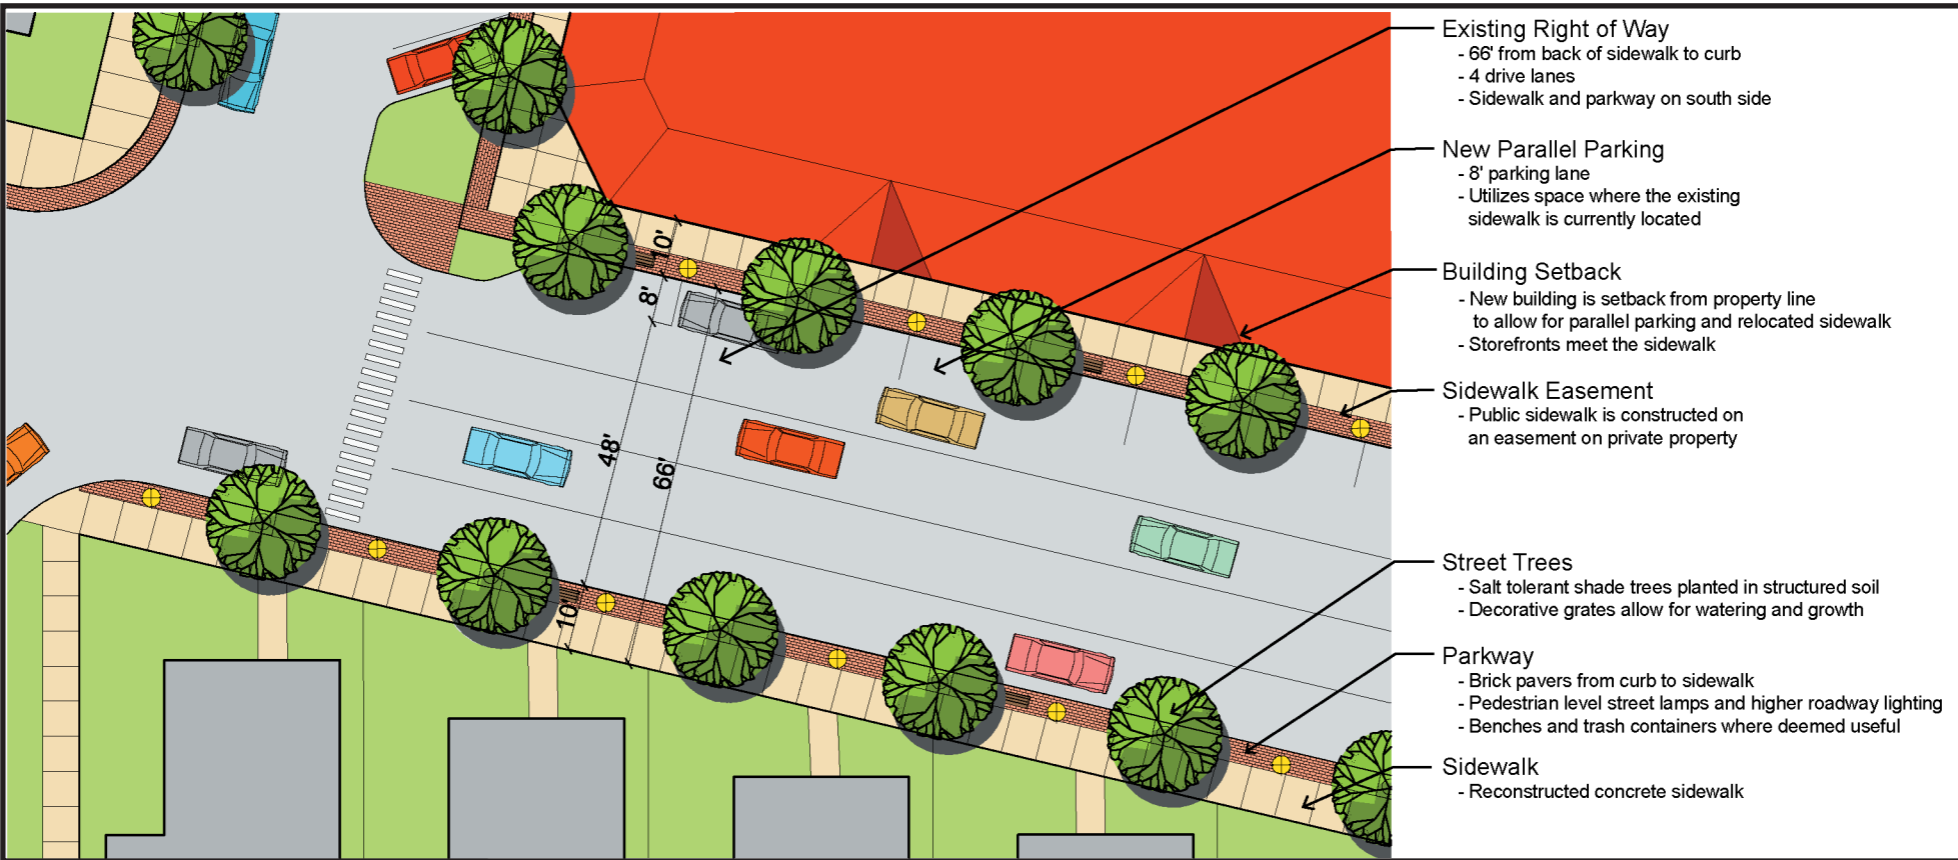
The addition of streetscape elements links together individual redevelopment projects up and down Grand Avenue. The band of red brick pavers in the parkway, the rhythm of street trees spaced evenly apart, and lamps placed at a level to light the walk for pedestrians all combine to soften and unify the avenue as a place. Locating elements in the parkway also creates a buffer between the sidewalk and moving traffic. Implementation of the streetscape construction in conjunction with redevelopment projects allows a space to be reserved for a row of parallel parking spaces. These on-street parking spaces make quick stops and visits to shops, or dwelling units, possible, while also adding an even more substantial buffer protecting the sidewalk zone. Space for the parallel parking is still in the public right of way, created by moving the sidewalk in front of the new building onto private property, but with an easement for public access.
